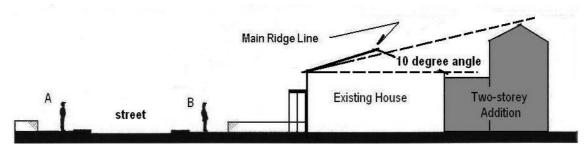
Side view of a two-storey addition to a single storey dwelling may be partially visible in distant views (eg to person A) but should be contained within a 10° building envelope established from the front of the dwelling and using the gutter line as the base line. The addition should be almost wholly invisible to person B.
